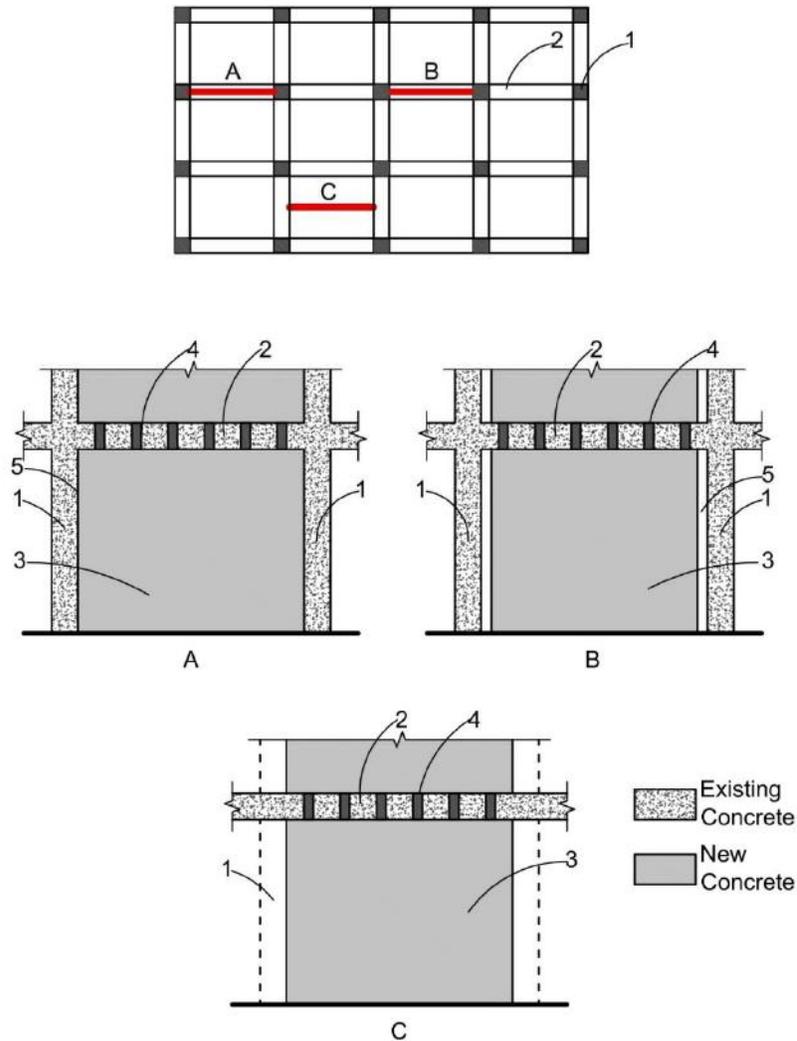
Various RC shear wall configurations: A – wall in line with the frame gridline, integrated with the columns; B – wall in line with the frame gridline, with gaps at the ends; C – wall offset with regard to the frame gridline (1- existing RC column; 2- existing RC floor slab; 3- new RC shear wall; 4- holes for passing the longitudinal wall reinforcement; 5- a gap between the new wall and the existing columns).
